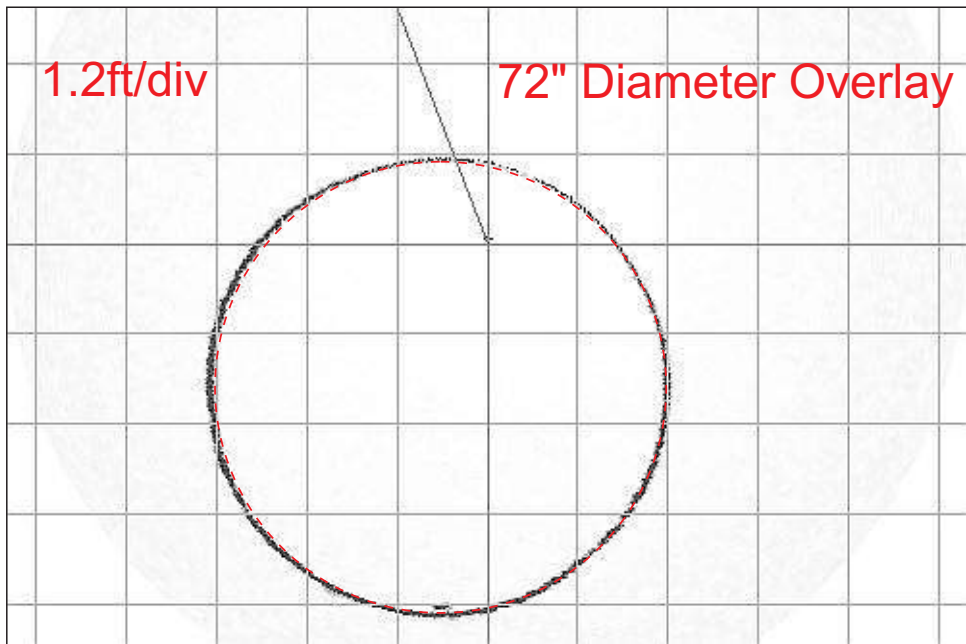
Sonar Profile 3 - 684 feet downstream of Access Point 1.
